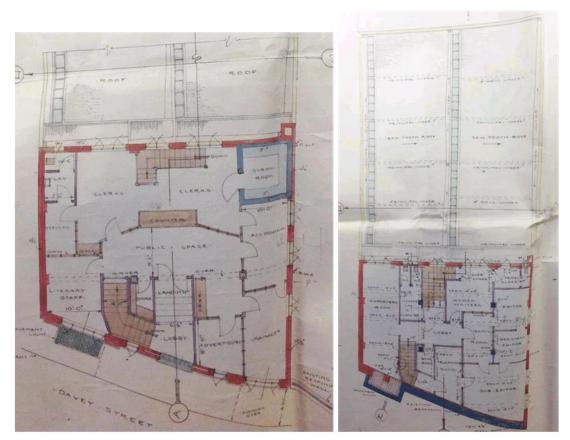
Davey Street level and highest basement level of the 1923 News Limited Building. Note that the lowest basement level was a large store/warehouse area and is also depicted on the plan sheet. Tasmanian Archive and Heritage Office AE417/1/170.
